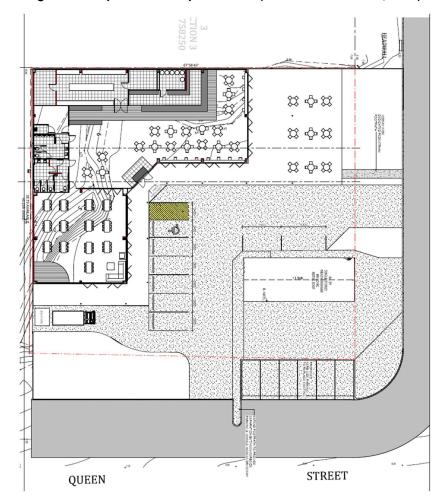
Existing Site Plan (CAD DESIGN & DRAFT PTY LTD 2023)
